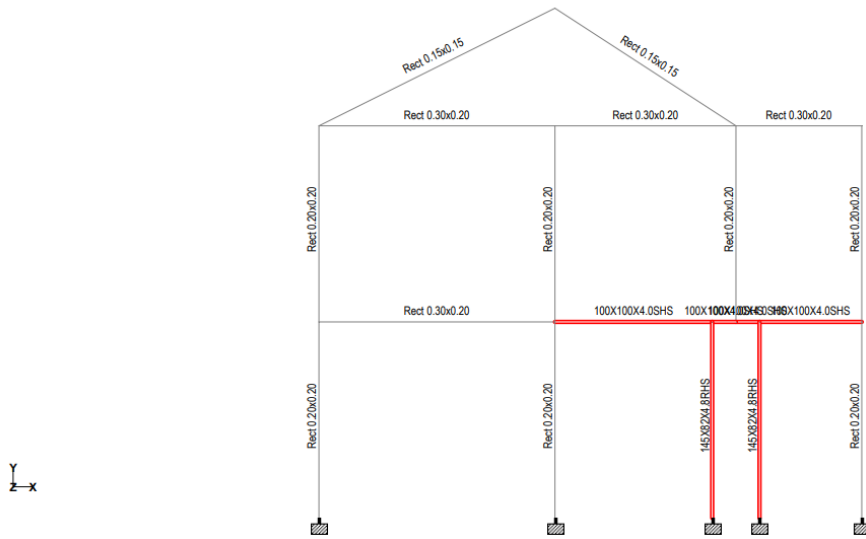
Strengthening bathroom joint at mahudha timber lime structure
